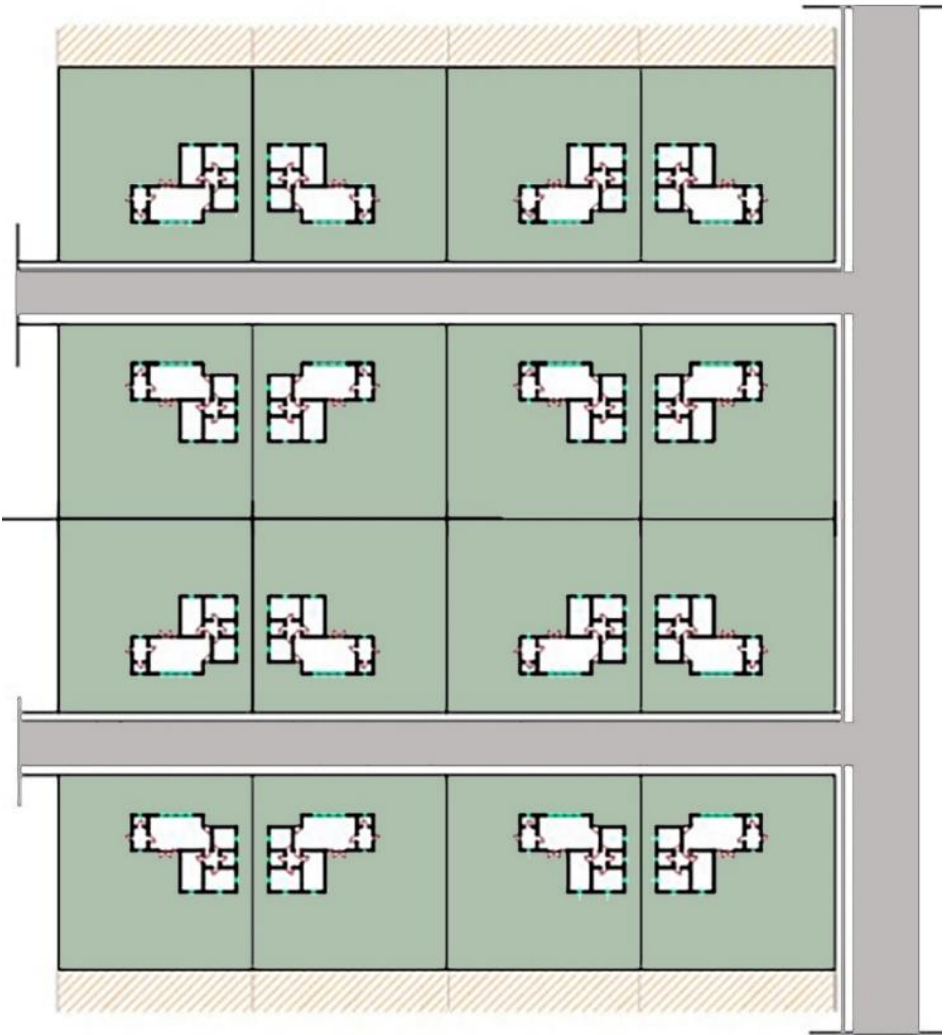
Site plan of a typical housing pattern. Source: Prepared by the authors.
